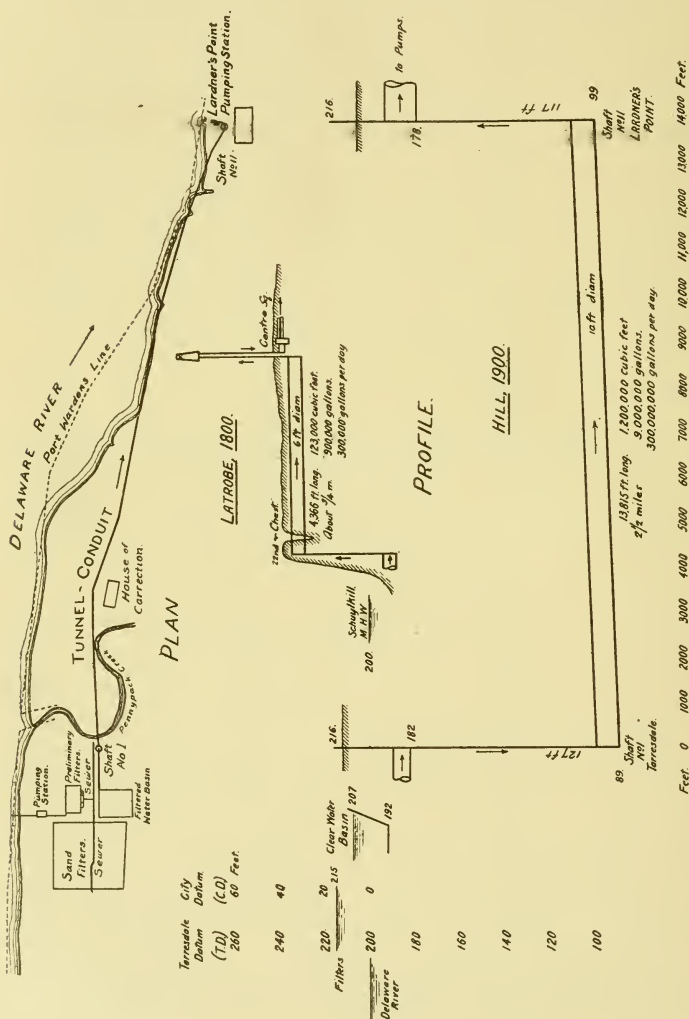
PLAN AND PROFILE OF TORRESDALE TUNNEL CONDUIT OF 1900, AND PROFILE OF CONDUIT OF 1800.
